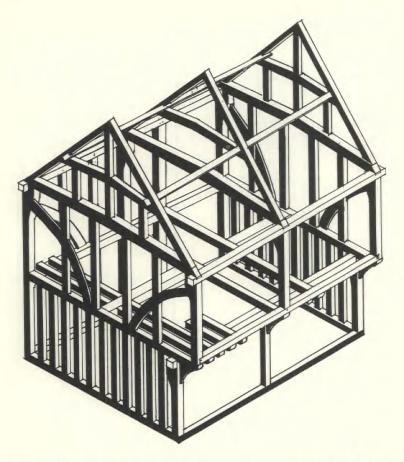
No 9 West Street, Dunstable: reconstructed isometric of frame.
